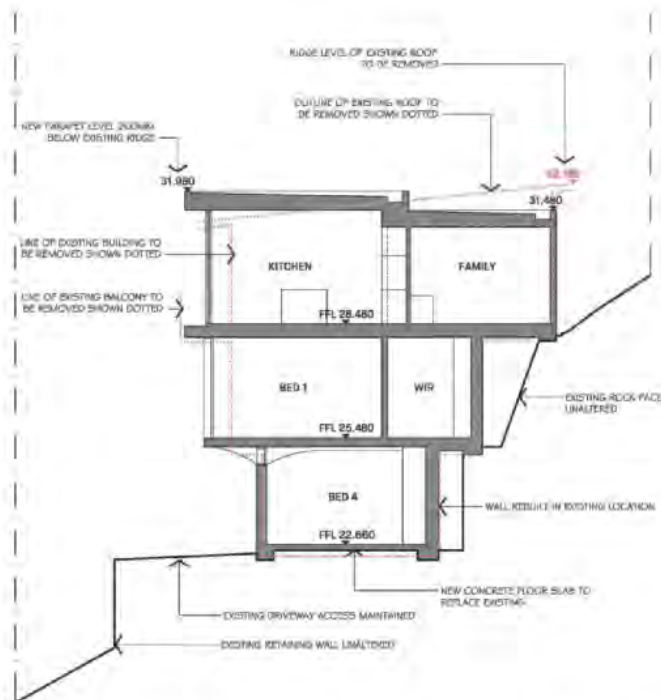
Shows the minimal change to the building height and bulk and scale of the proposed development (in black outline), when compared to the existing dwelling house (in red outline).
